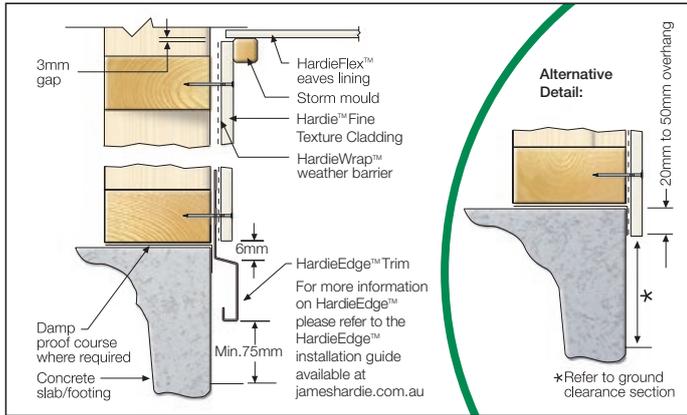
SLAB/EAVE JUNCTION DETAIL
